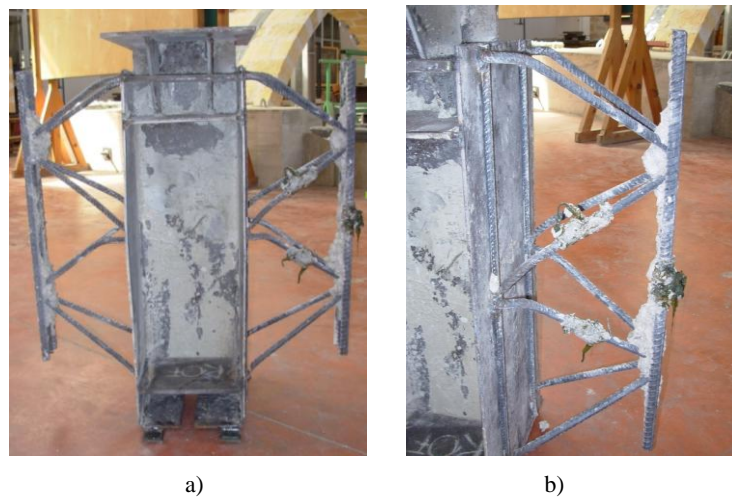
Specimen P1 at failure: a) lateral views; b) top view (Badalamenti 2010).
